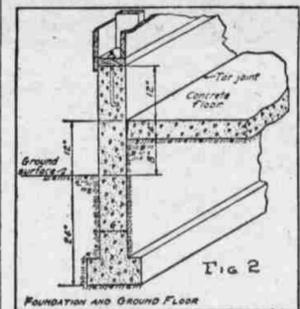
Showing a Good Method of Making Foundation and Floor of a New Building Ratproof.
